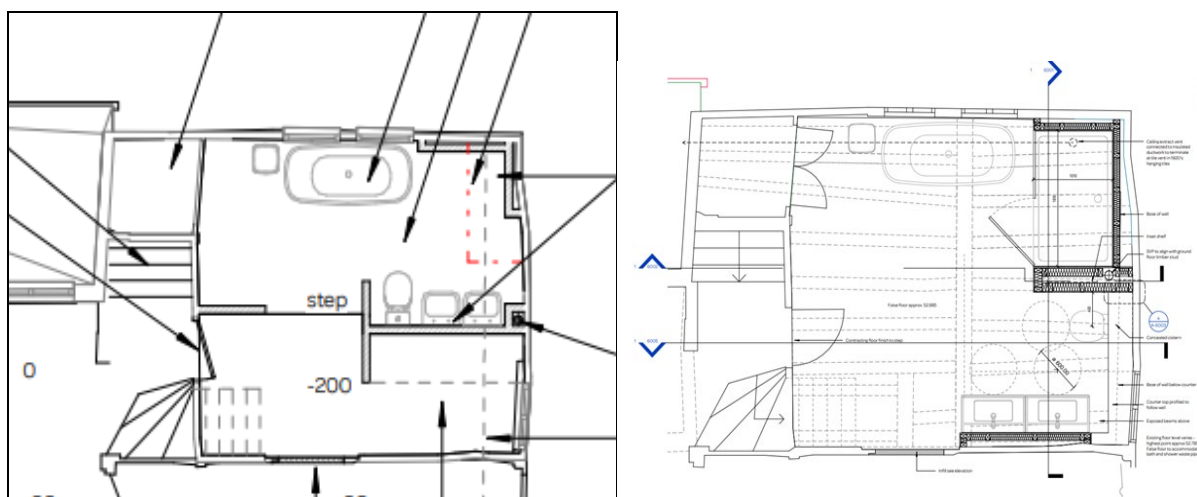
Previously approved and proposed floor plans, side by side for comparison.
